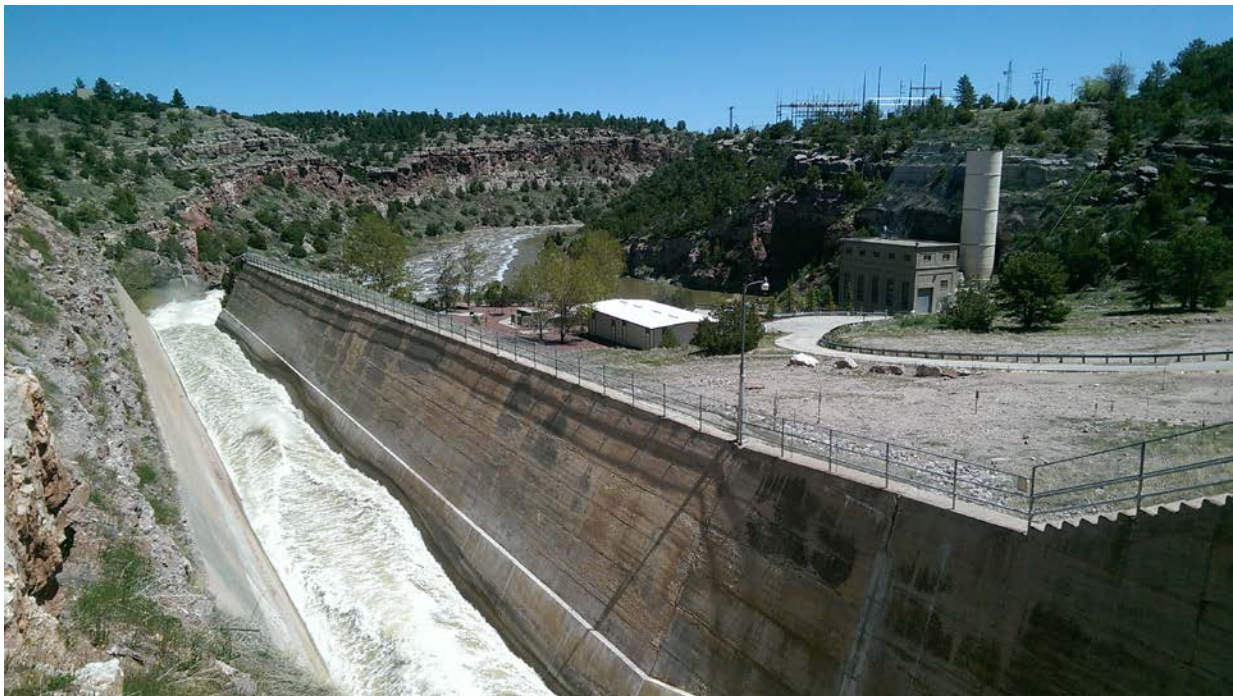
Downstream View of Existing Outlet Works From Guernsey Reservoir Dam.
